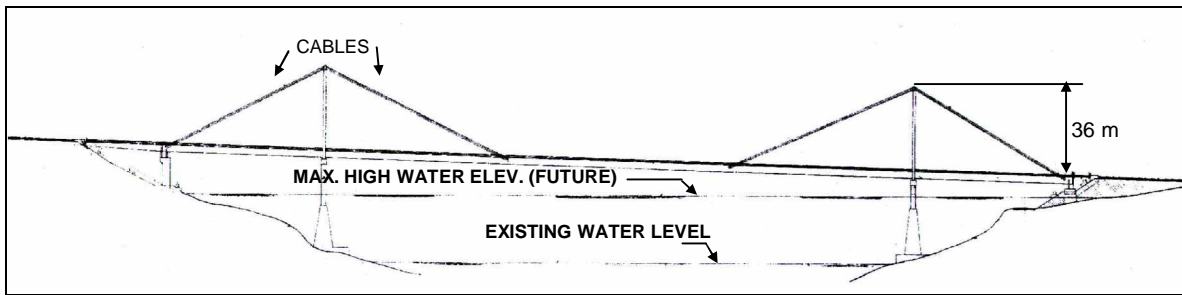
Side elevation of Hawkshaw Cable-stayed Bridge
